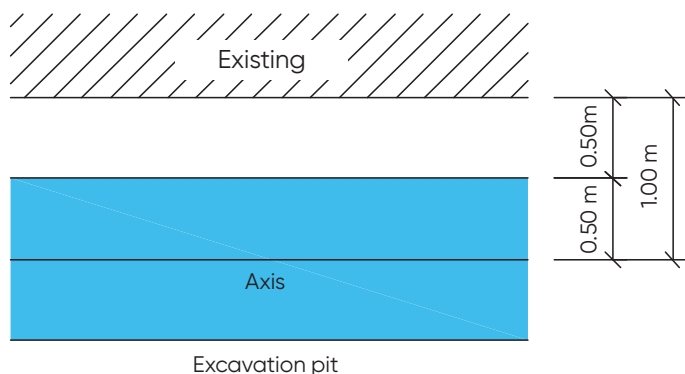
Distance between diaphragm wall axis and outer edge of existing building.
